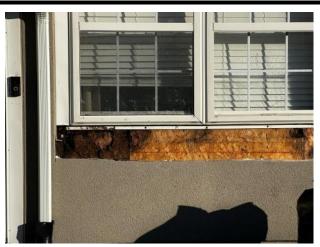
Overview of existing sheathing in poor condition below a lower window at Unit 3.
